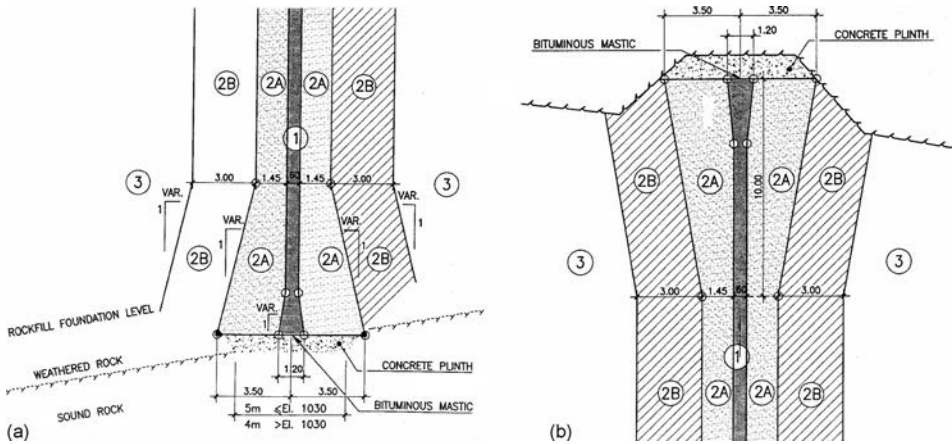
Knezhevo dam, core foundation detail in the banks; (a) vertical section; (b) horizontal section. (1) Asphaltic concrete core; (2A) fine transition zones, crushed andesite, 0–60 mm; (2B) coarse transition zones, crushed andesite, 0–250 mm; (3) rockfill – schist, stones up to 650 mm.
